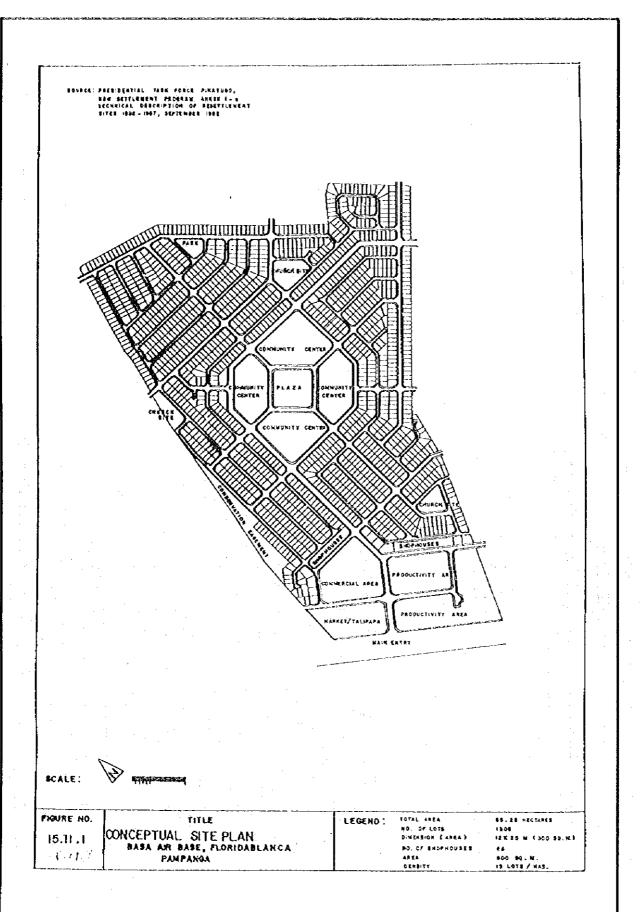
Conceptual Resettlement Site Plan (1/3)
